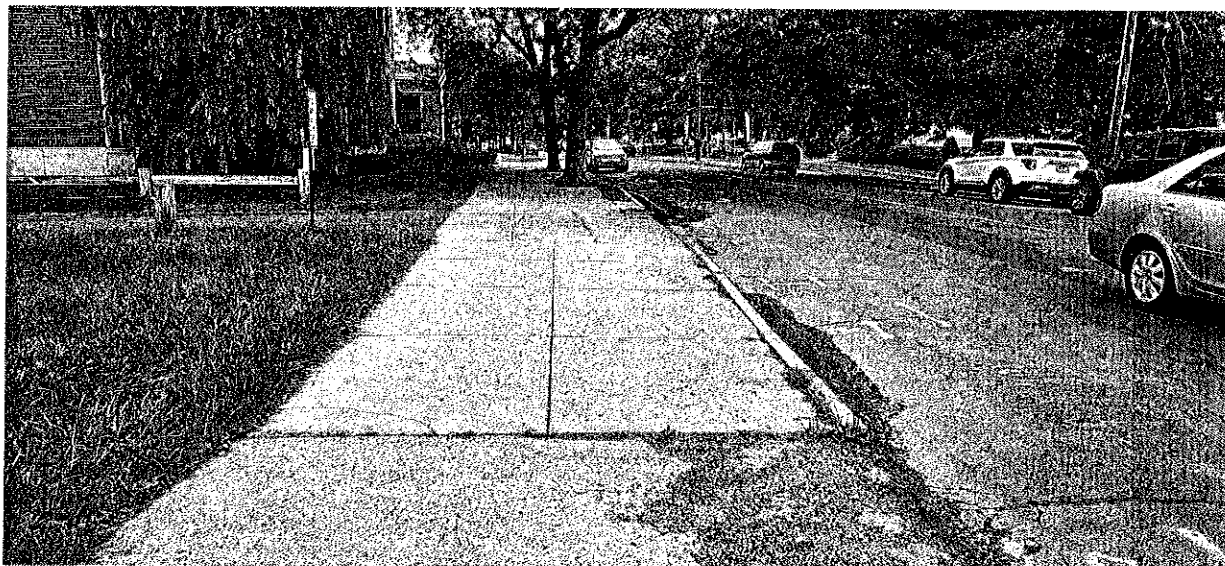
Spalling concrete sidewalk and heaving sidewalk at trees.
